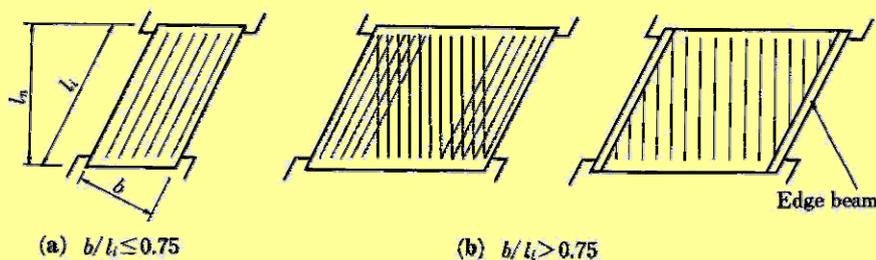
Arrangement of primary reinforcement in skewed slab
